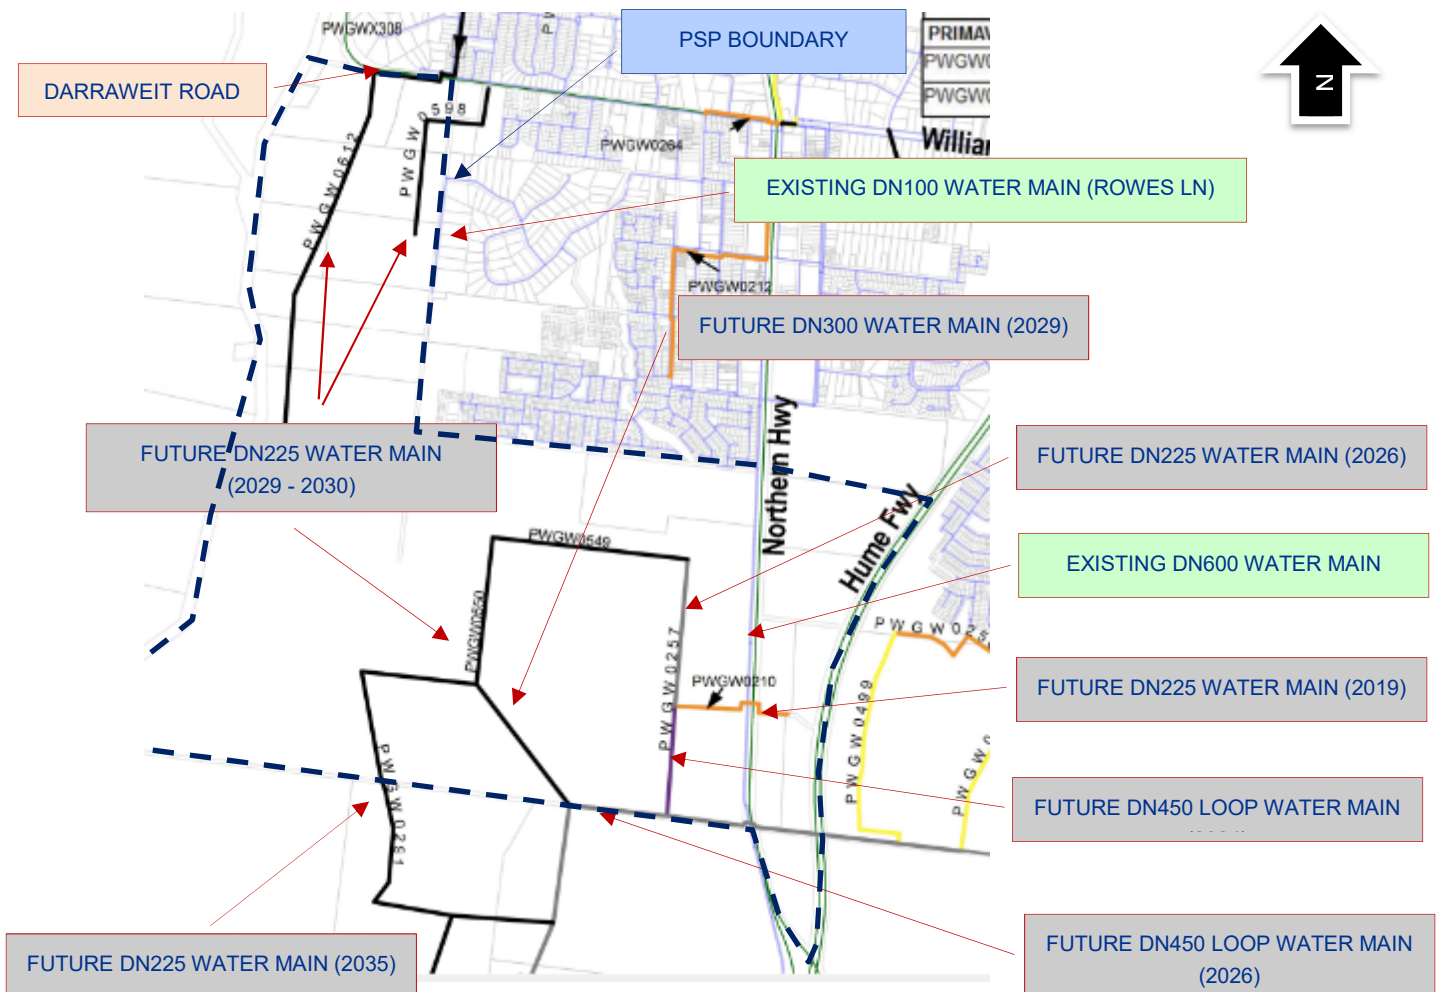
YVW Beveridge Wallan Planned Water Assets - Refer Appendix A.2.1 (Not To Scale)
